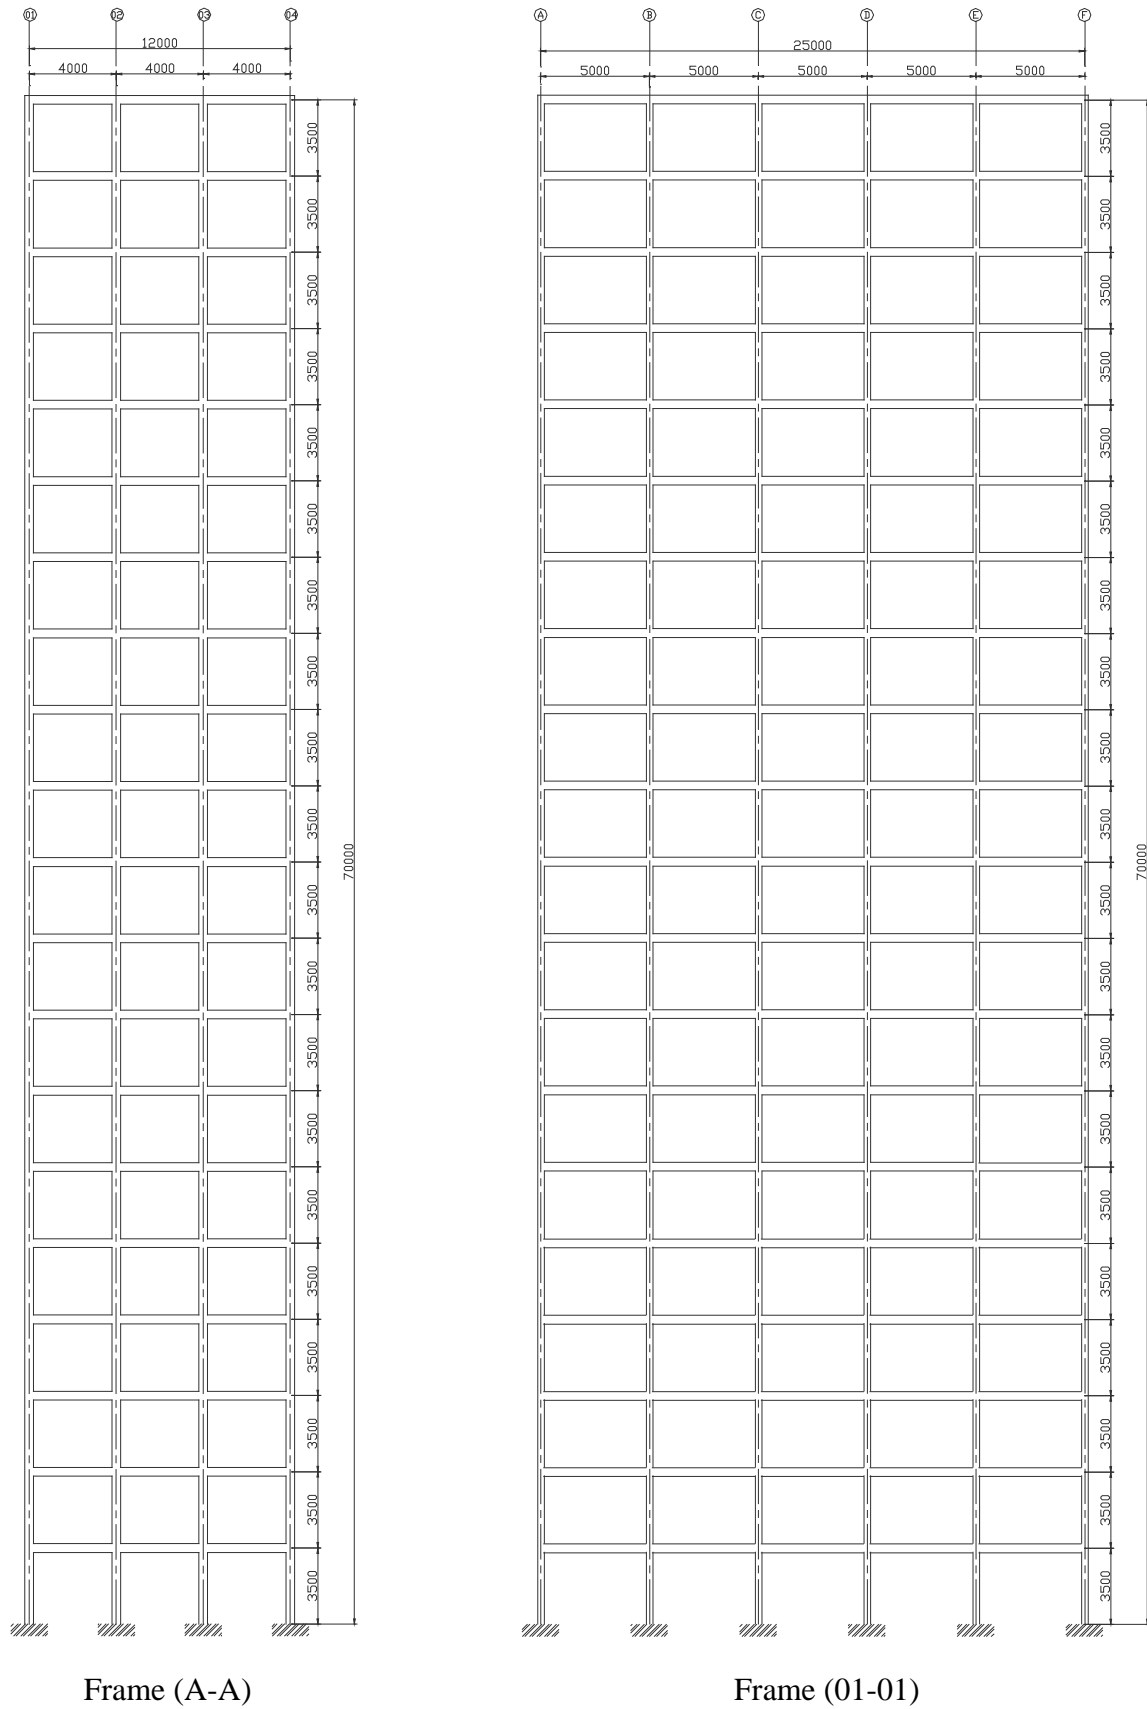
Frame (A-A) and (01-01) of twenty-story regular RC building (all dimension are in mm)
